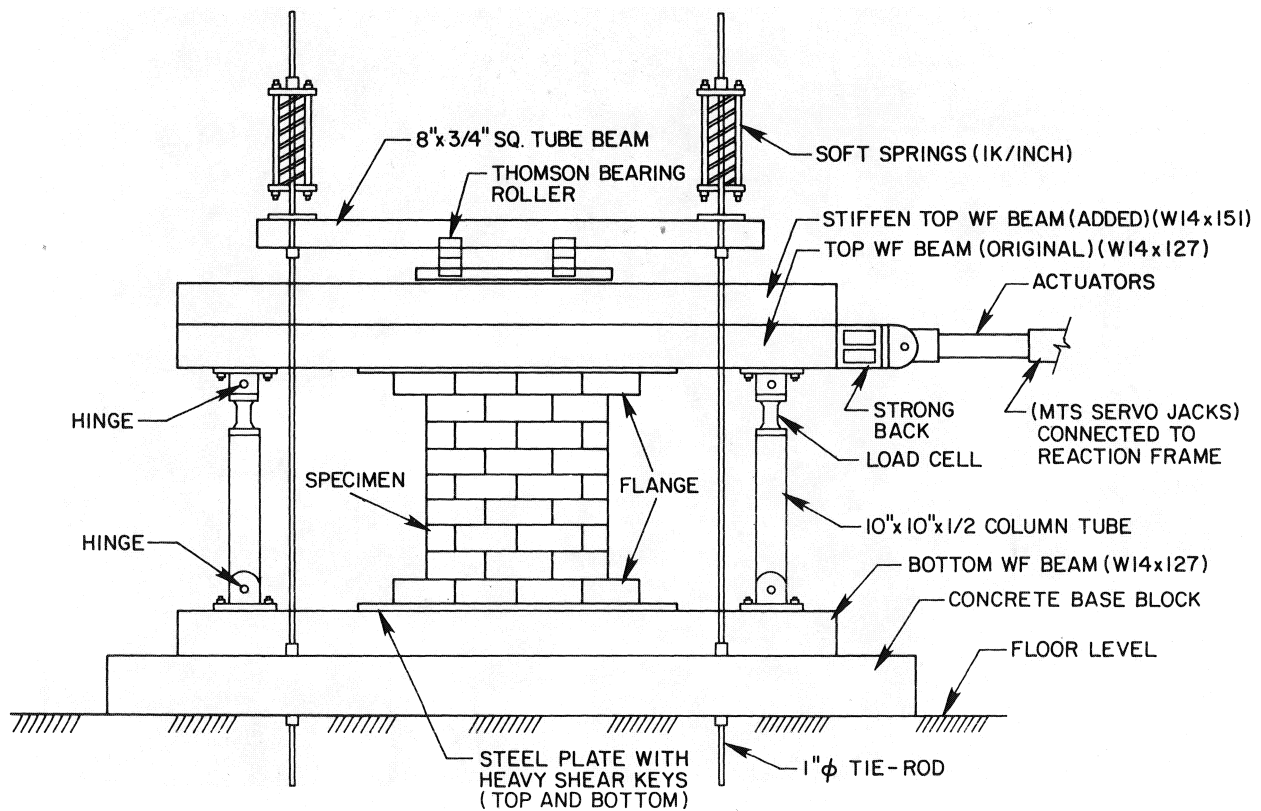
Masonry shear wall test setup from Chen et al. (1978)
